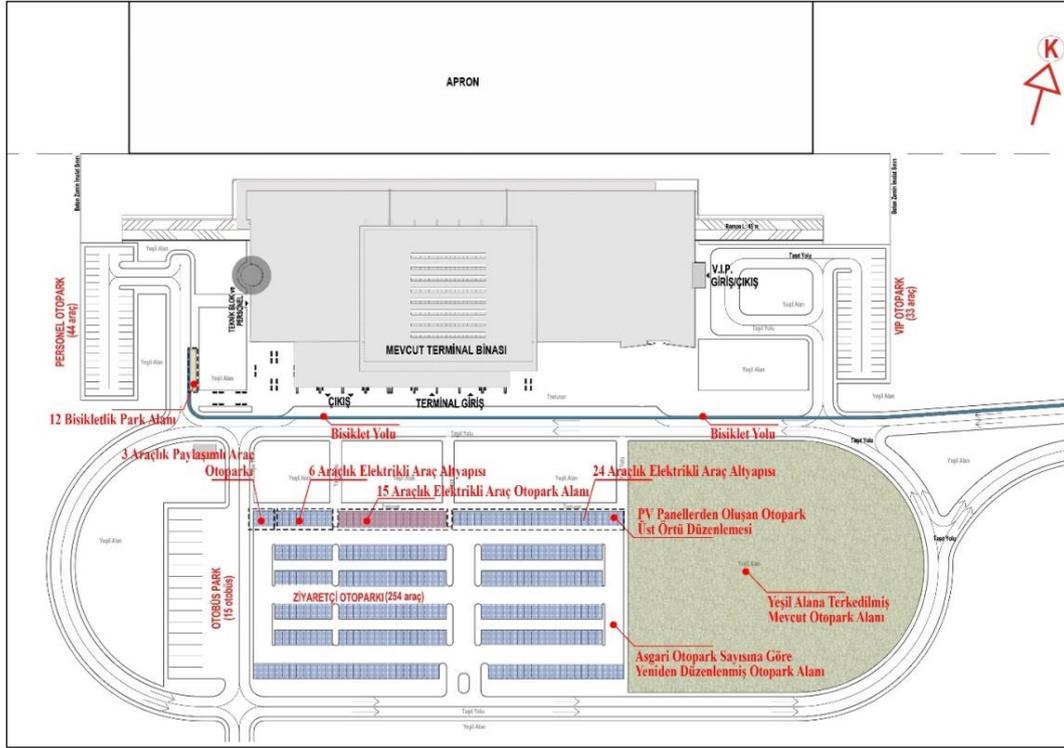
Proposed site plan study for Kahramanmaraş Airport terminal building
